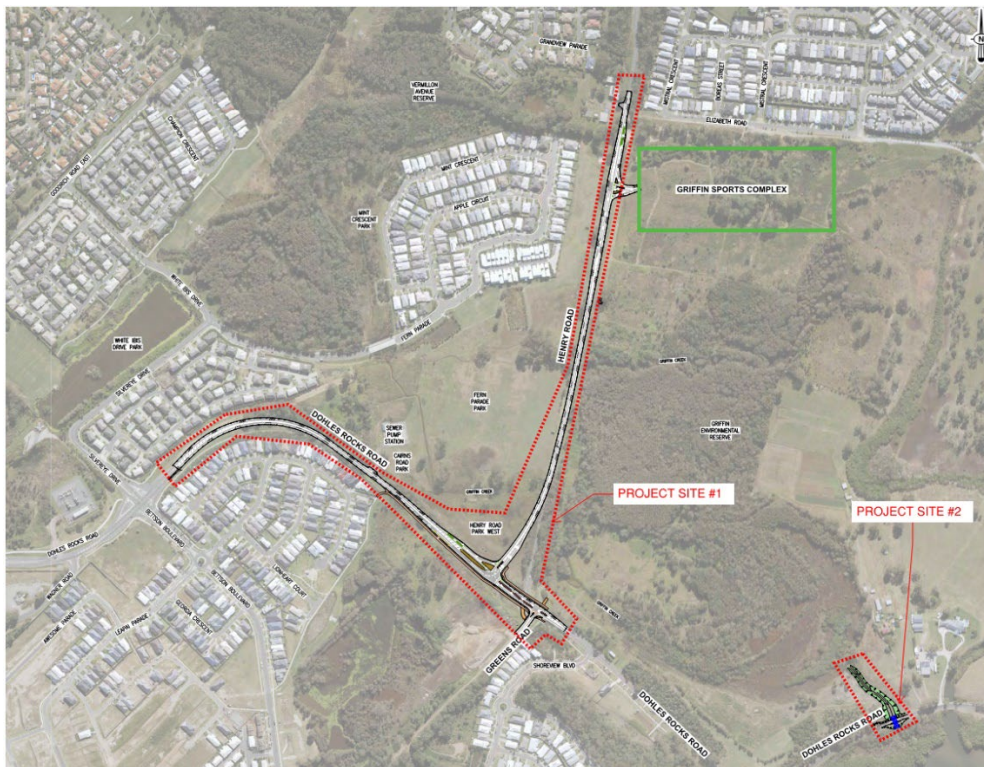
Henry Road/ Dohles Rocks Road Intersection - Project Site Locations
